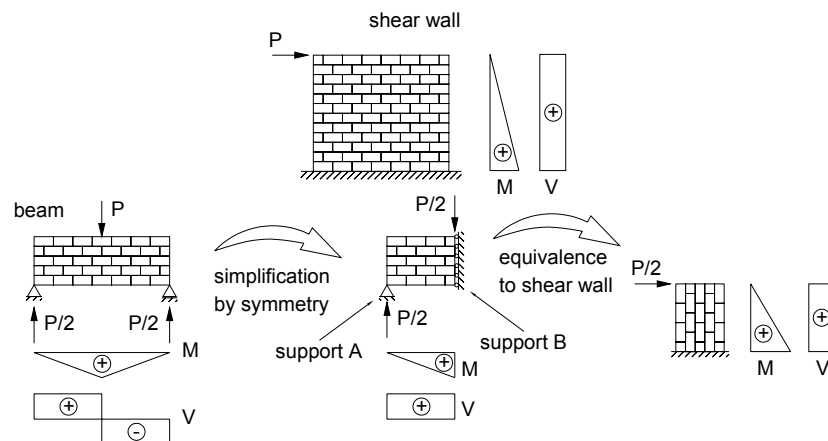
Equivalence between shear walls and masonry beams subjected to a concentrated load.
